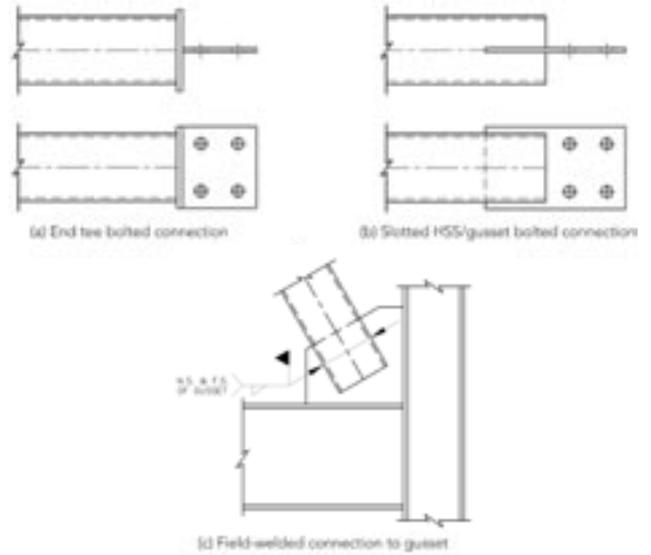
Bracing connections with bolts or welds in shear.
